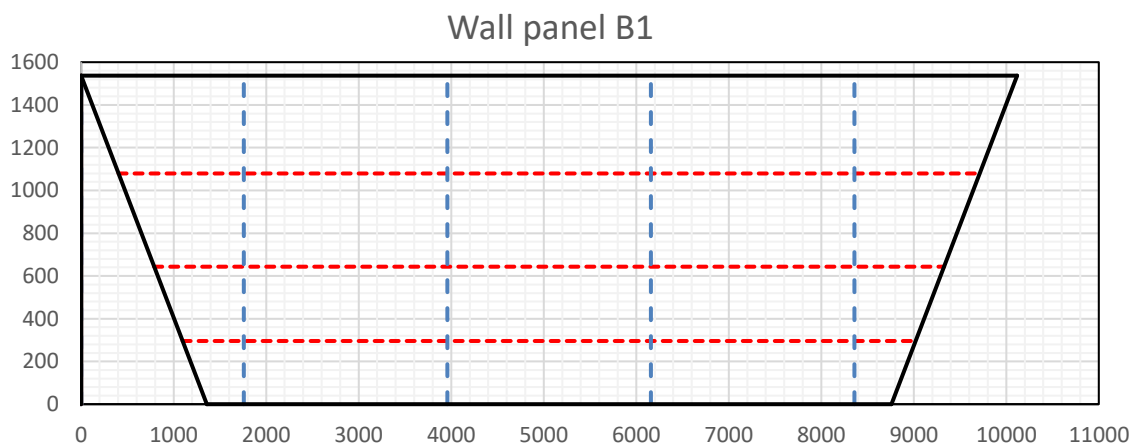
Dimensioning tool visualization of stiffener layout for the example wall panel.
